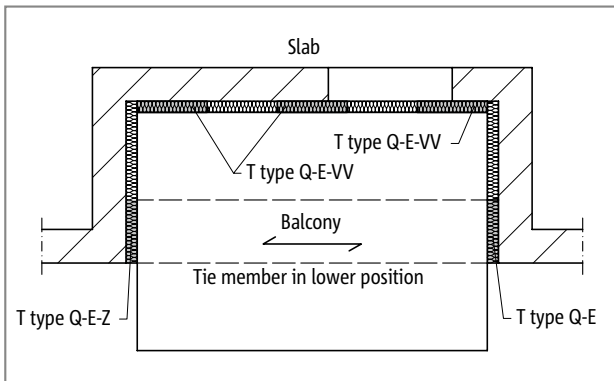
Schöck Isokorb® T type Q-E, Q-E-Z and Q-E-VV: Recessed balcony supported on three sides with tie member
